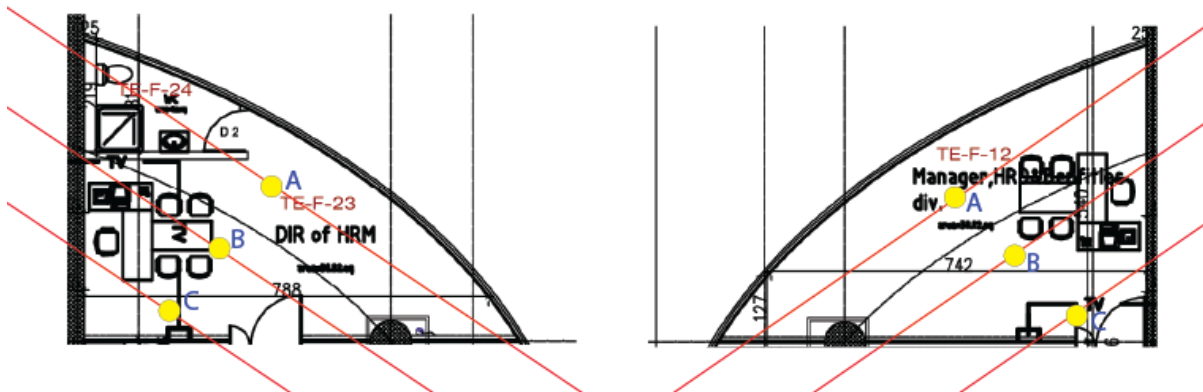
Floor Plan Showing Grid Points in North and West Orientations
